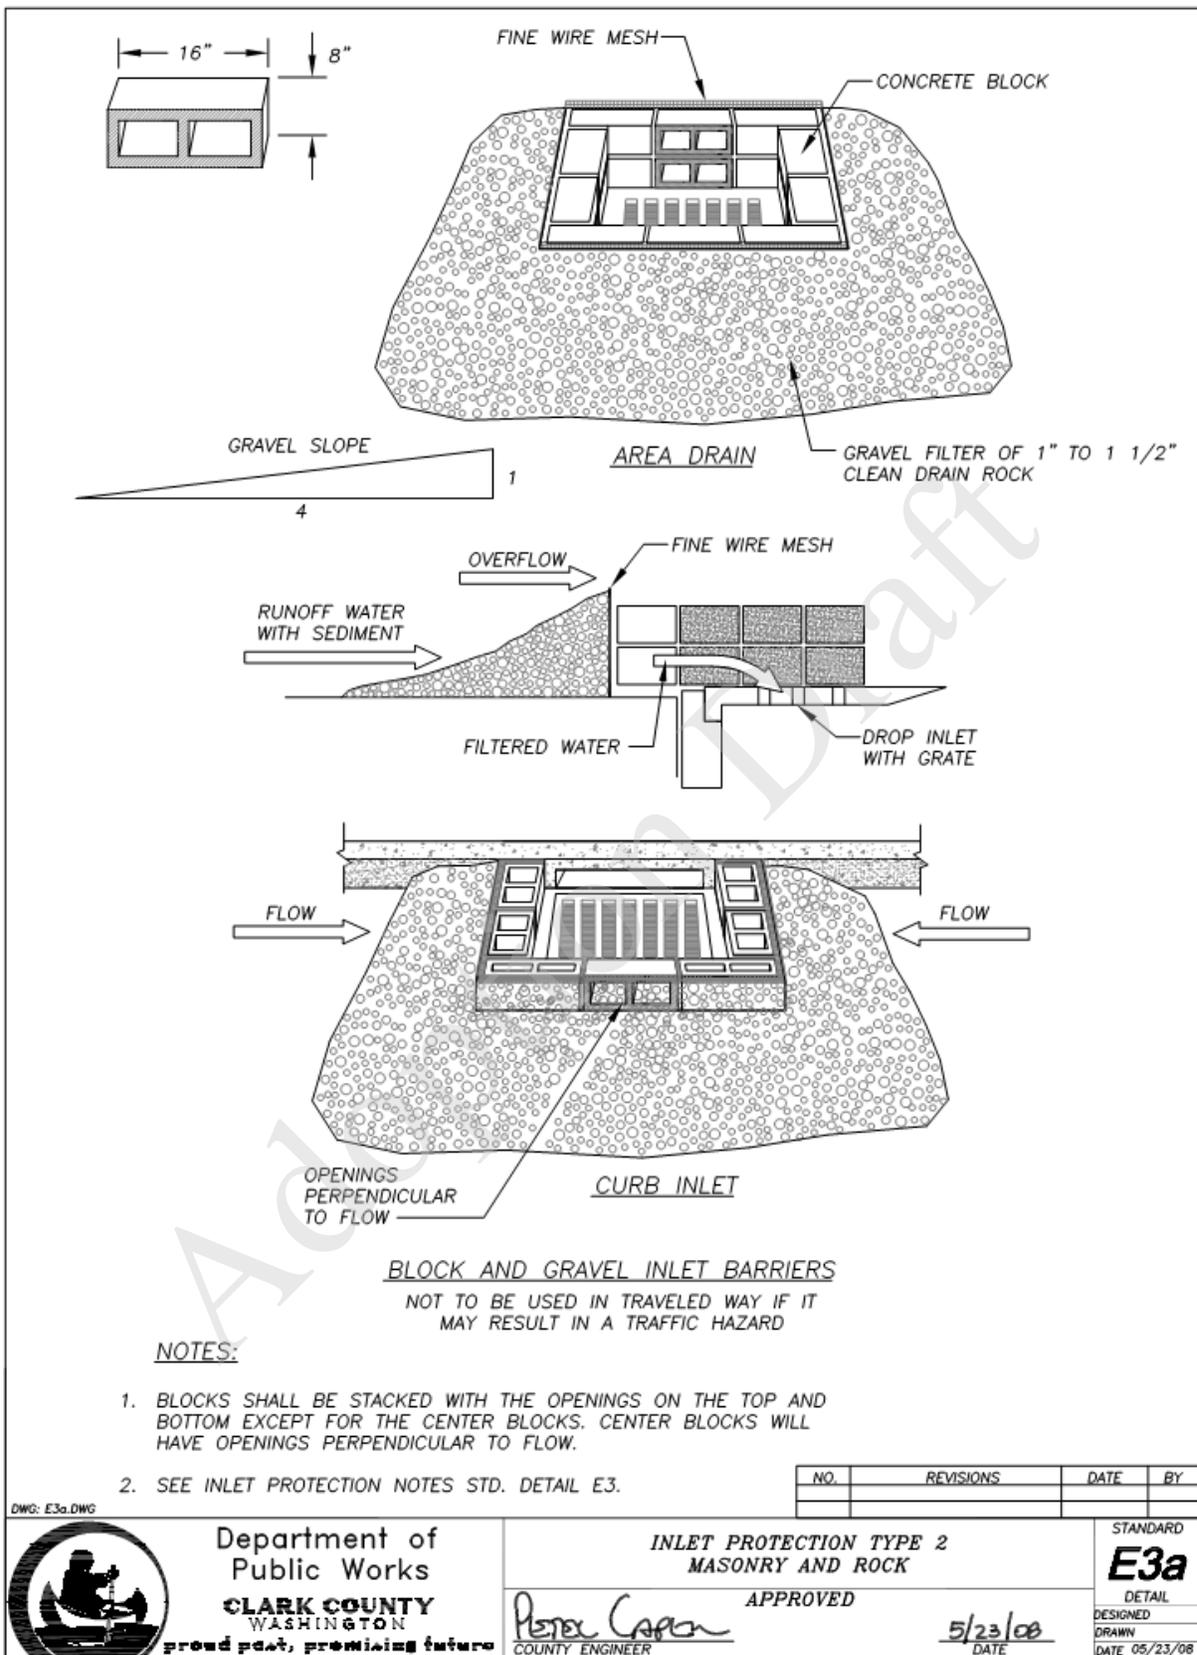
BMP C220 - Inlet Protection -Type 2 Masonry and Rock
